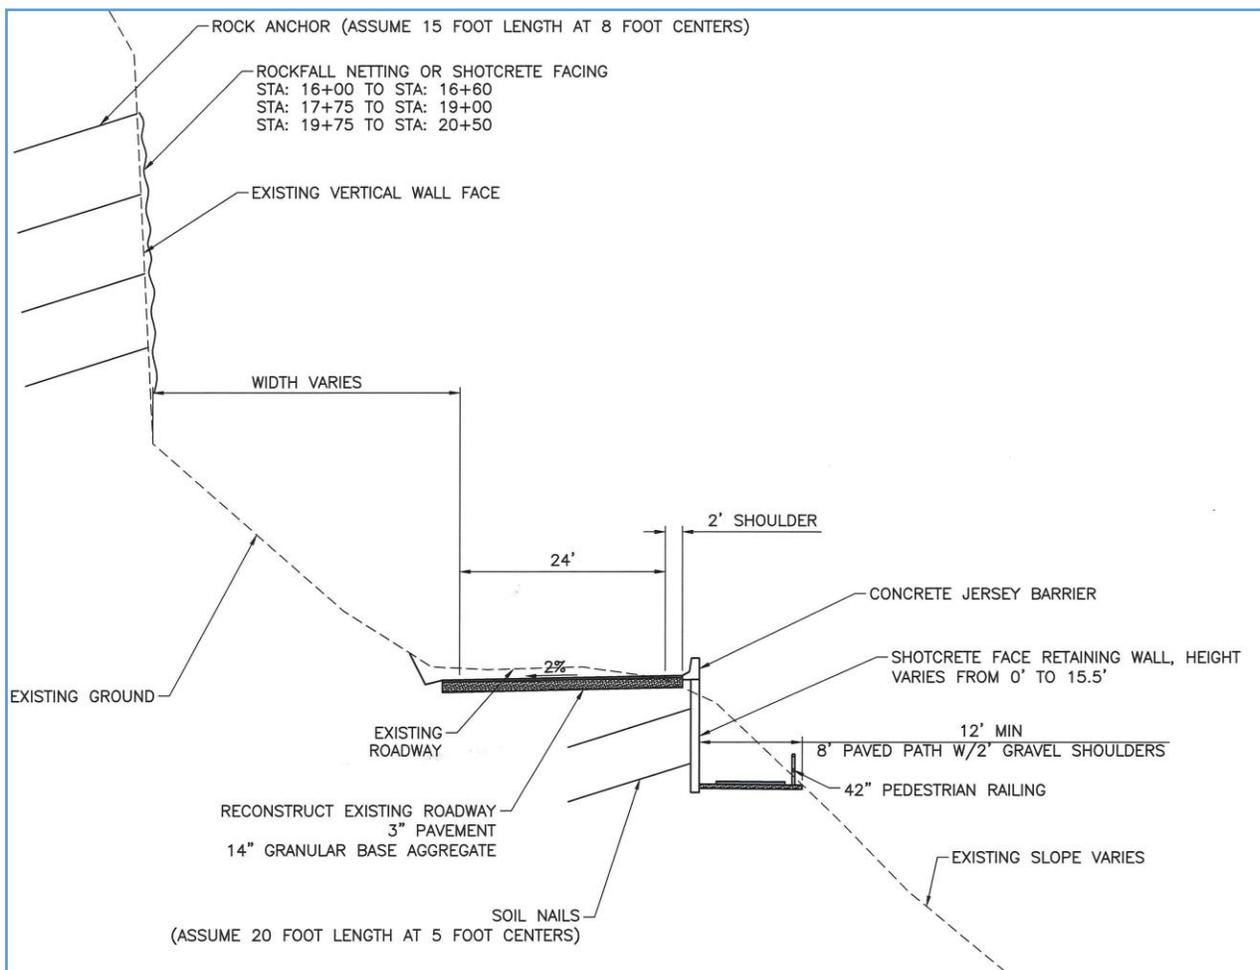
TYPICAL SECTION – ALTERNATIVE 2 - LOWER ROADWAY SECTION – BELOW UPPER HAIRPIN CURVE
